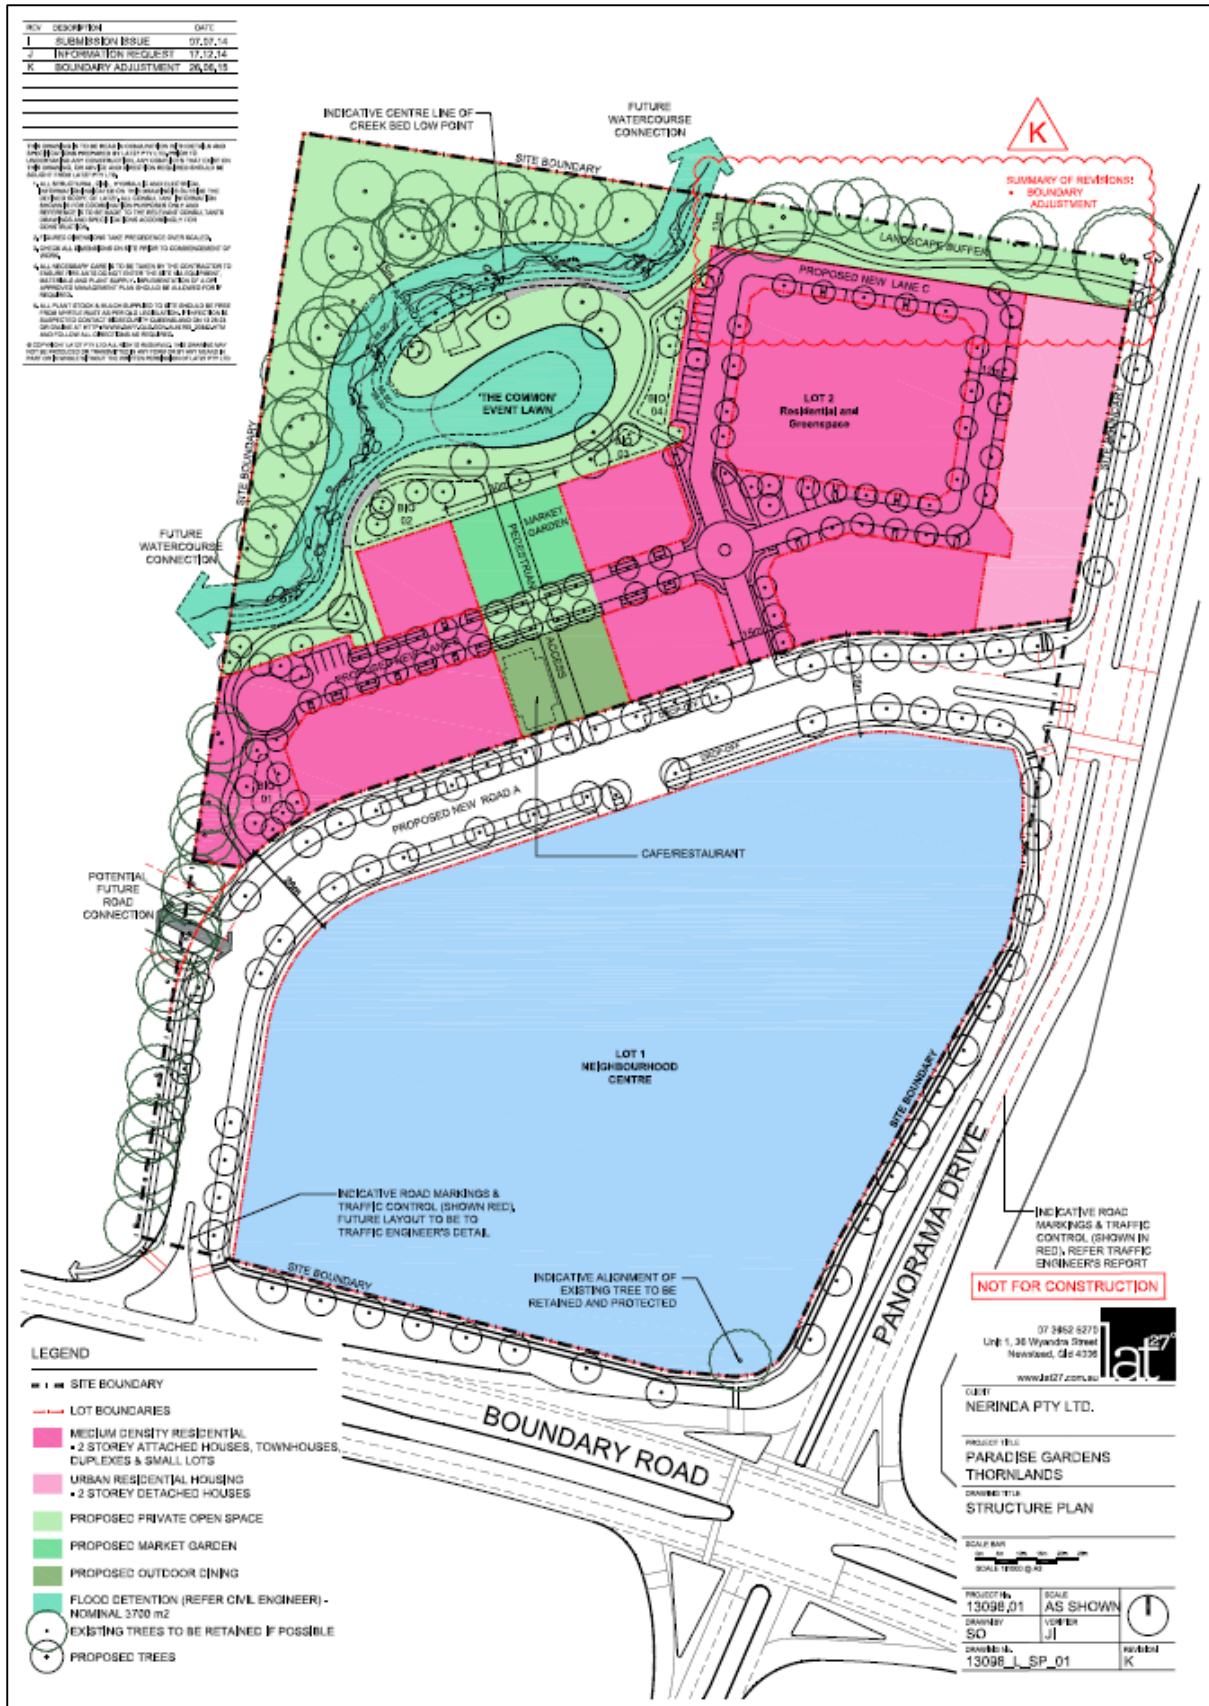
PARADISE GARDENS STRUCTURE PLAN (26-6-15)
